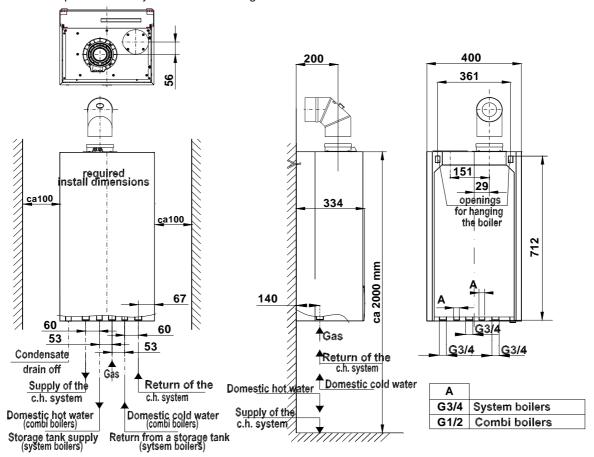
Installation dimensions of boiler ECOCONDENS SILVER PLUS
